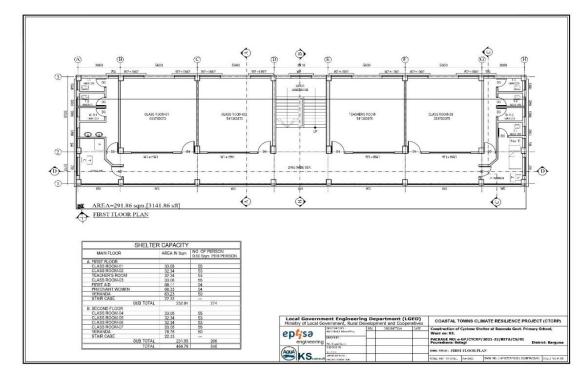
Site Layout Plan for the Cyclone Shelter, Fast Floor
